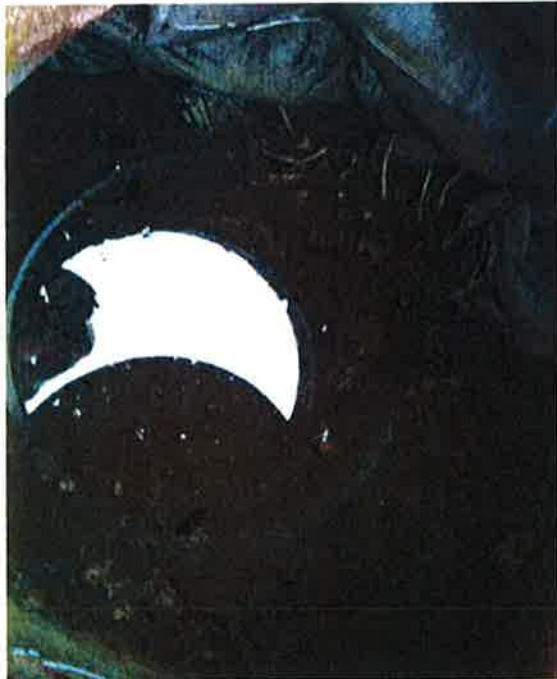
North chamber of outfall structure with sand bag filter (good water quality)
